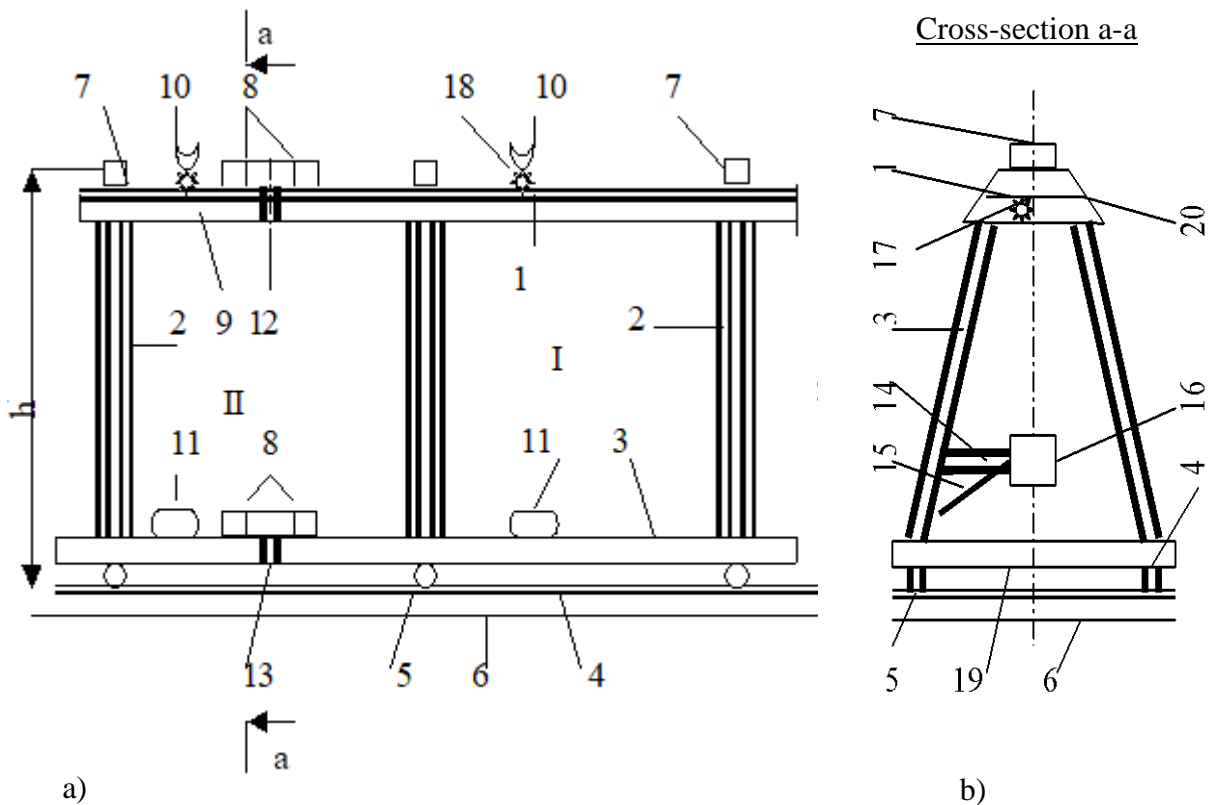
Equipment for strengthening ground and foundations and for performing pile foundations for strengthening slopes: a – general appearance; б – cross-section by "a-a" of the Portal
